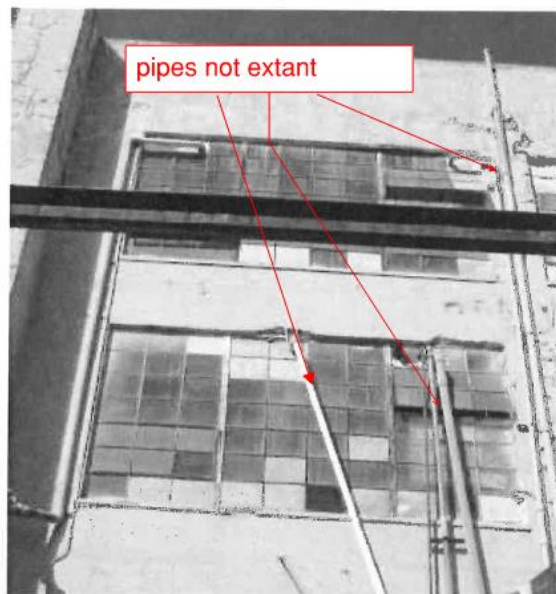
The second and third floor windows in the fourth window bay from the west. Knapp Architects photo, 2019.
